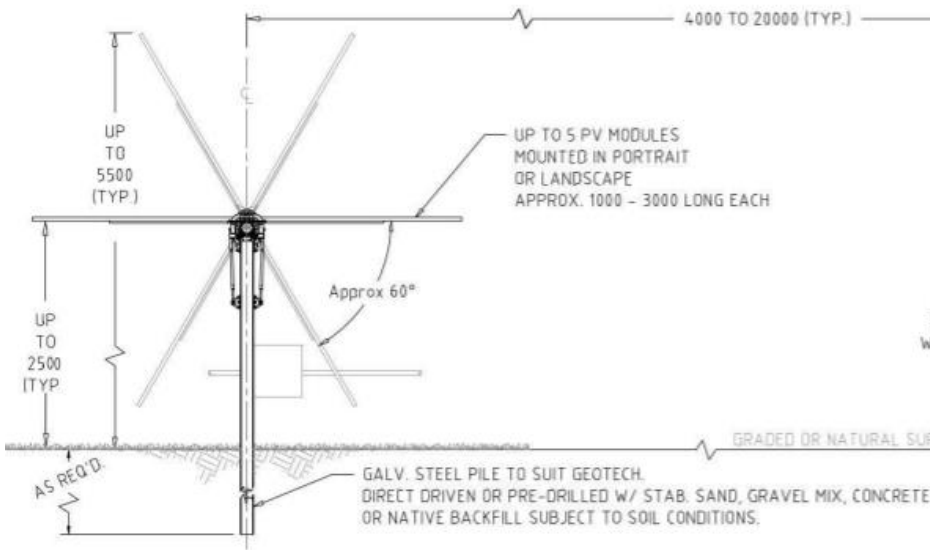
Elevation of proposed solar arrays (Advertised Development Plans)
